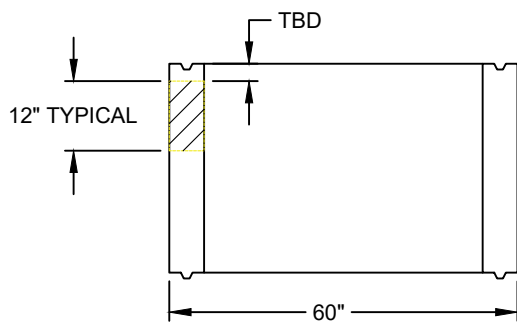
RISER PIECE STRUCTURE DIMENSIONS
